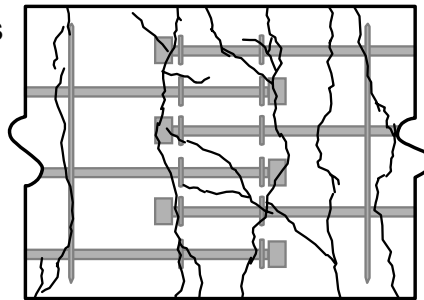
Crack development in a typical hairpin confined lap splice test (specimen LS-08-04.04-12-10(N)-1-H0.6)
